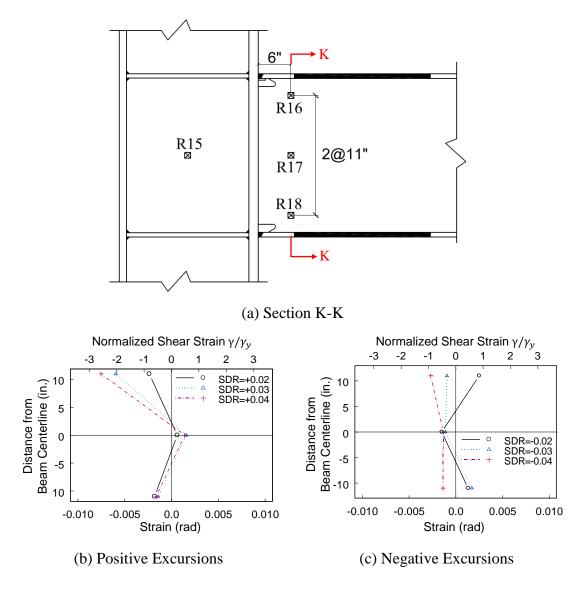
Specimen C1 Beam Web Shear Strain Profiles
